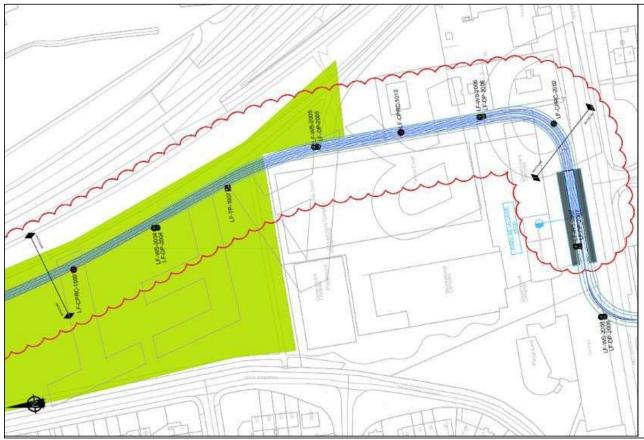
GI Plan Sheet 8, Luas Finglas (Barry Transportation and Eegis).
